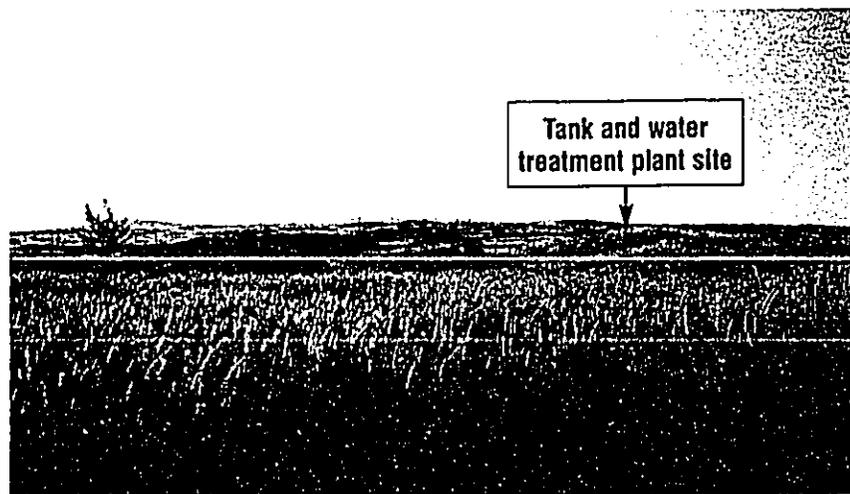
Southeast view (towards mauka) from the mauka Kūki'o property boundary towards the project site. Note the topographic depression at the right center where the tank and water treatment plant are planned to be located.
